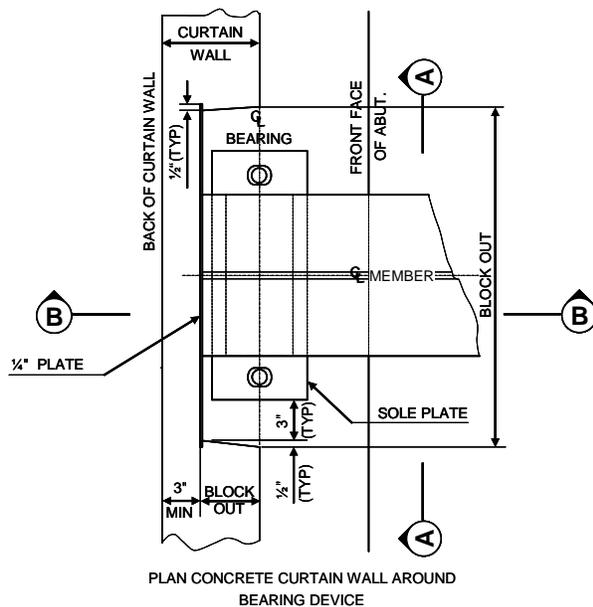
1 Plan detail of Curtain Wall Bearing Box Out
